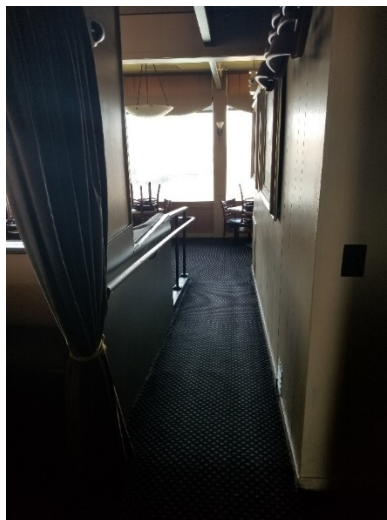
3<sup>rd</sup> Floor Ramp to Lower Dining Area
